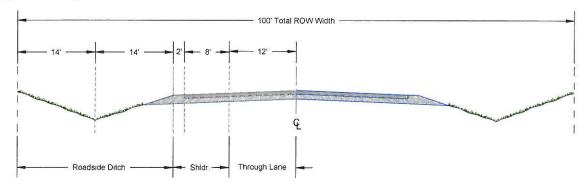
Typical Rural Principal Arterial Partial Cross-Section (4 Lane)
